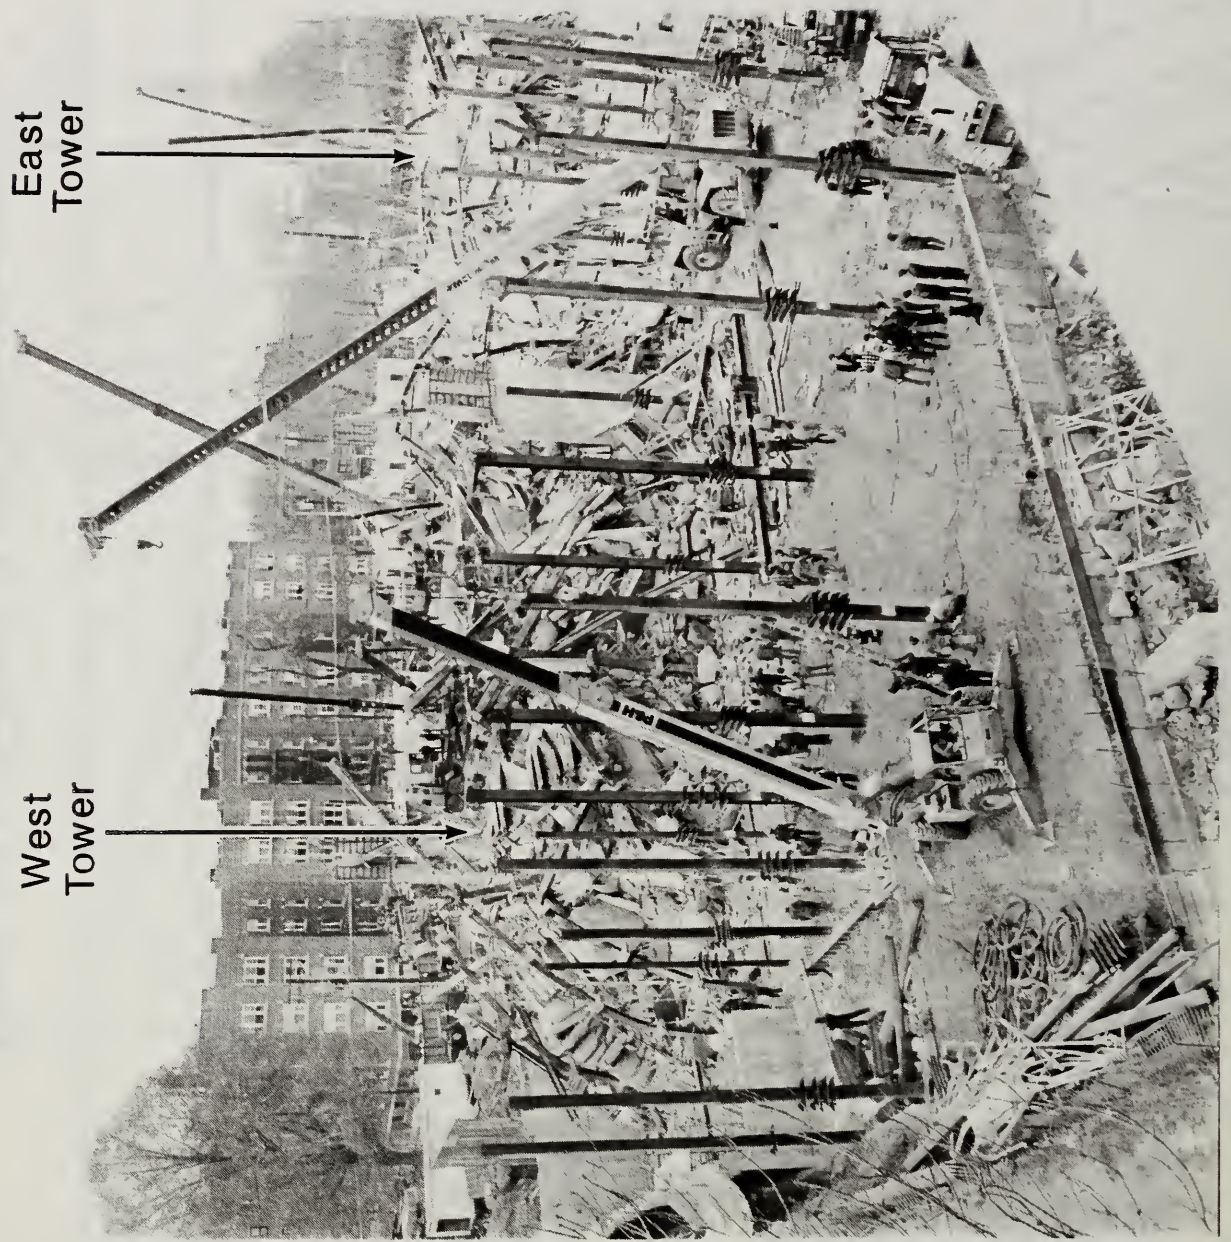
Overview of collapsed structure – View to the Northeast
